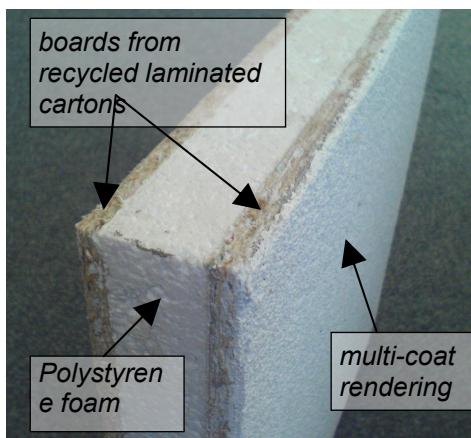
Cutting edge of sandwich facade panel test sample with exterior rendering
